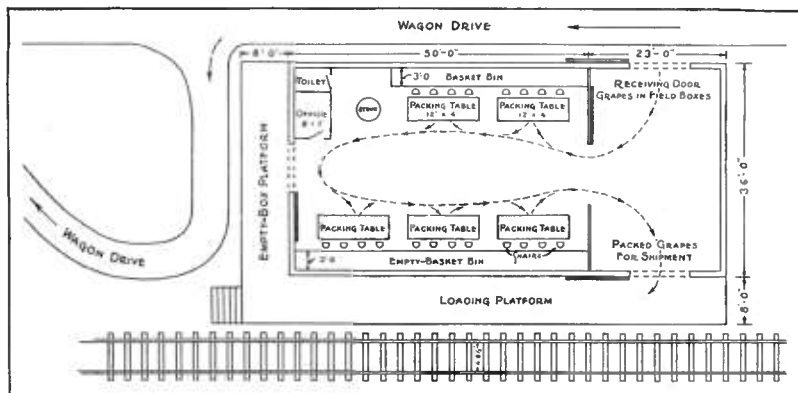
Floor plan of grape-packing house. Note arrangement of packing tables, packers' chairs, and basket bins.
